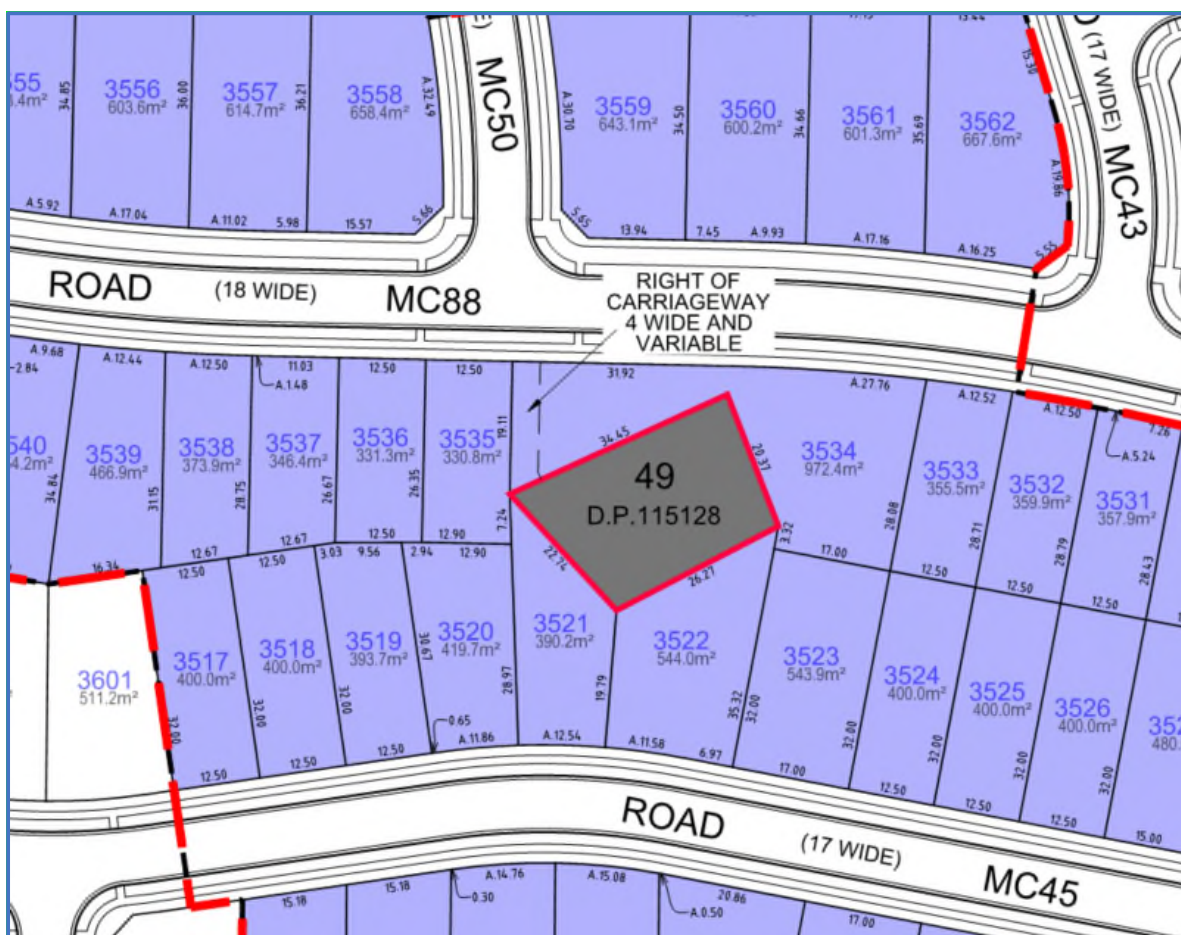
Showing integration of Lot 49 DP115128 (Source – Subdivision Plans, Rev. S, June 2022)
